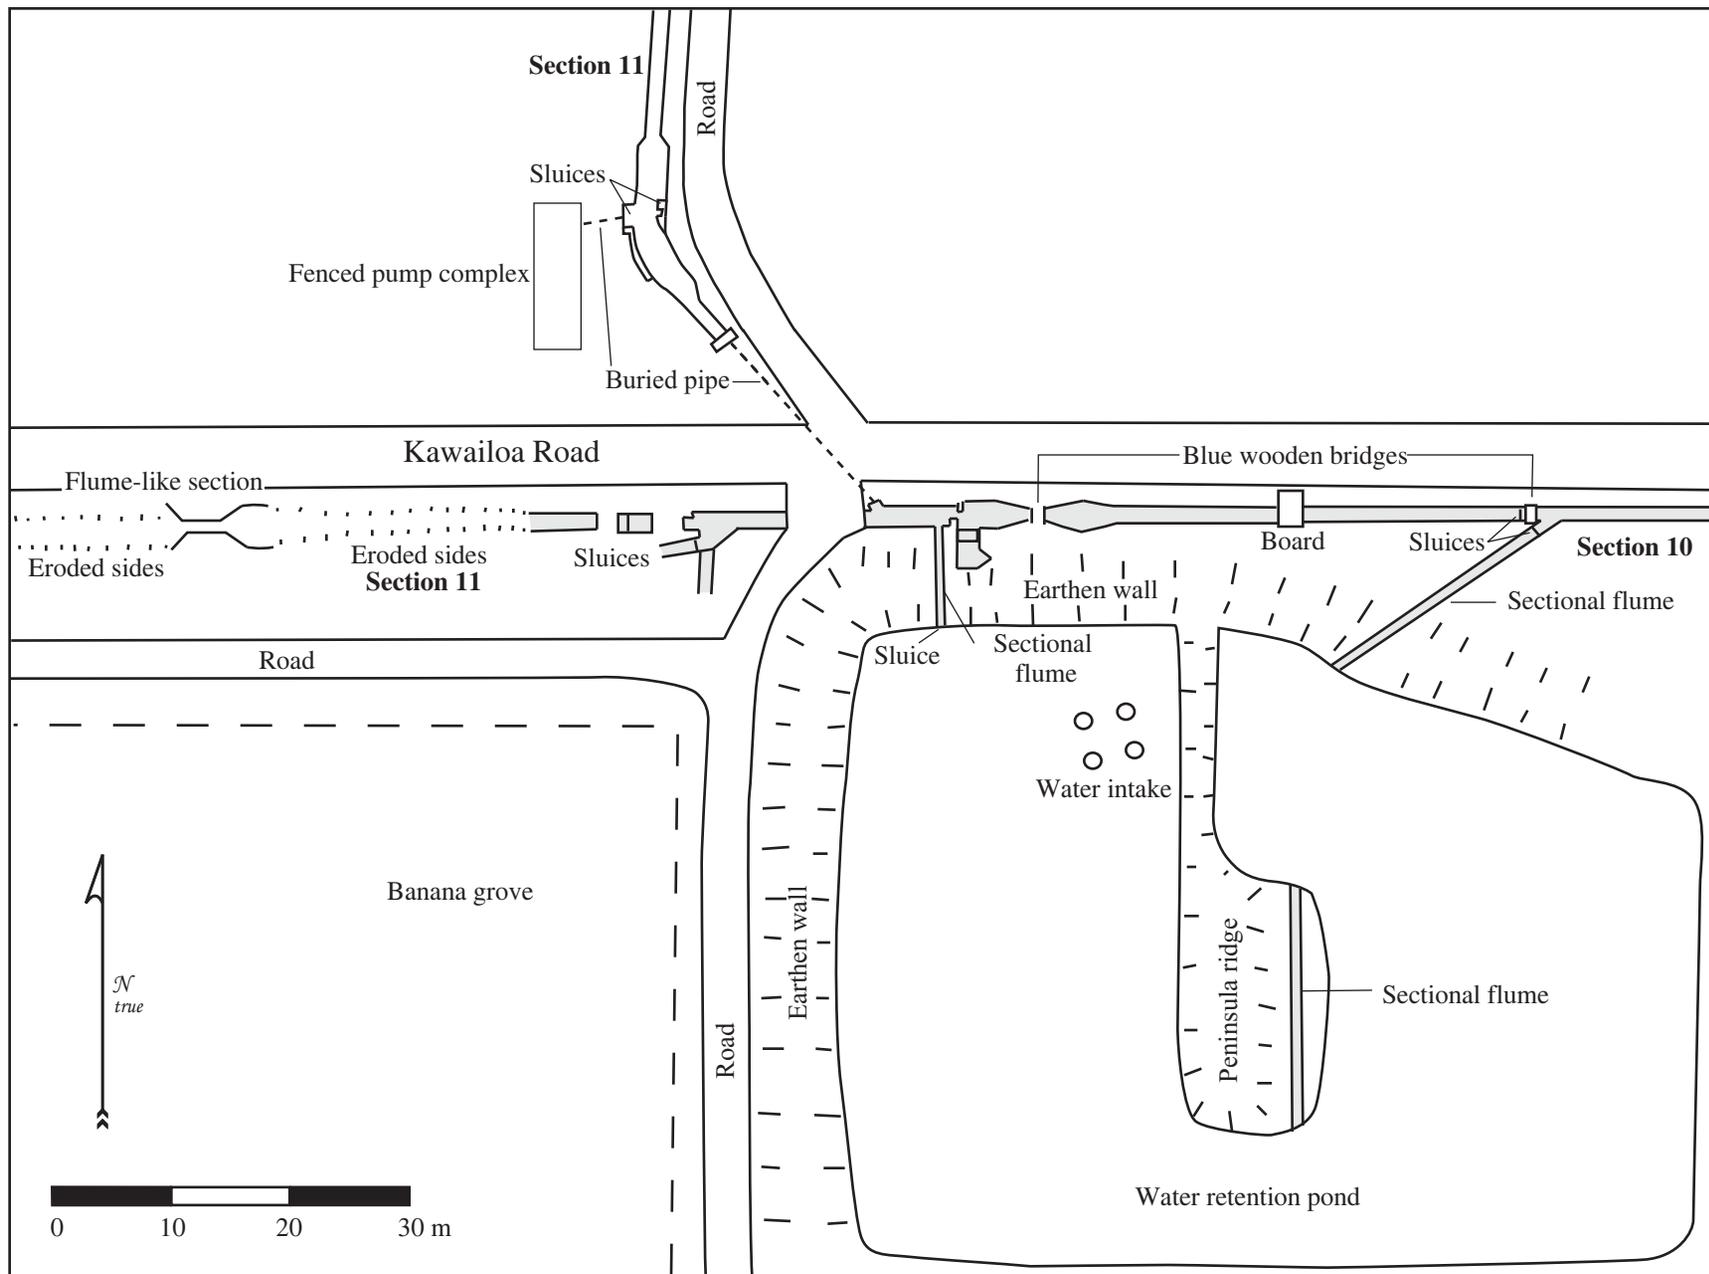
Site 7159 Sections 10 (west end) and Section 11 (east end) plan view showing sluice gate complexes.
